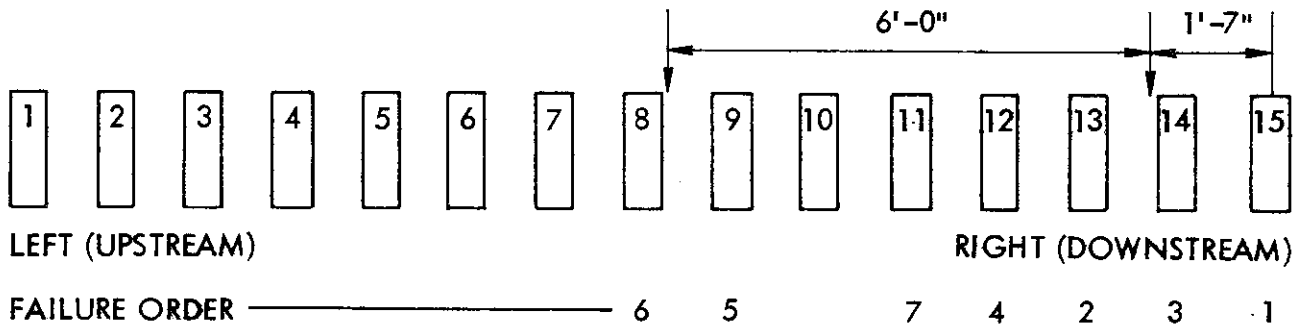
Numbering system and failure order of stringers for deck tests 1 and 2.
